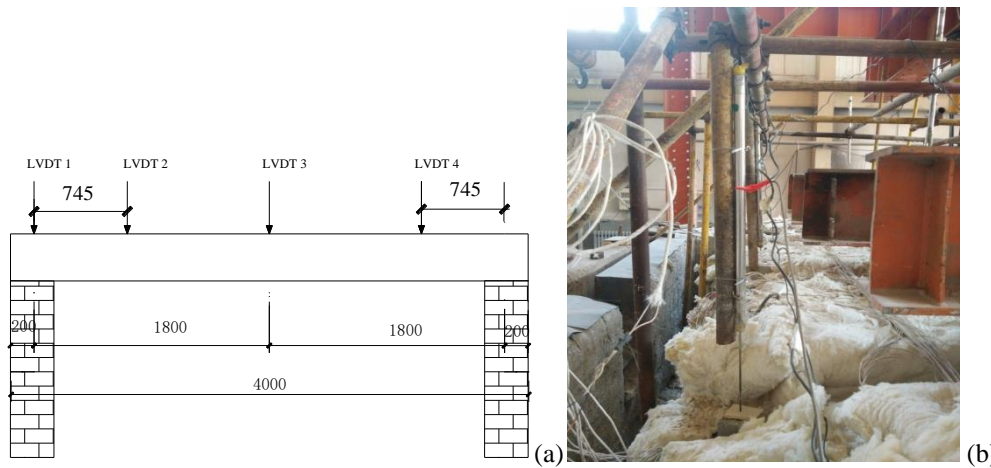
Displacement meters layout of specimens (dimensions in mm):a)LVDTs layout; b)LVDTs layout in site
